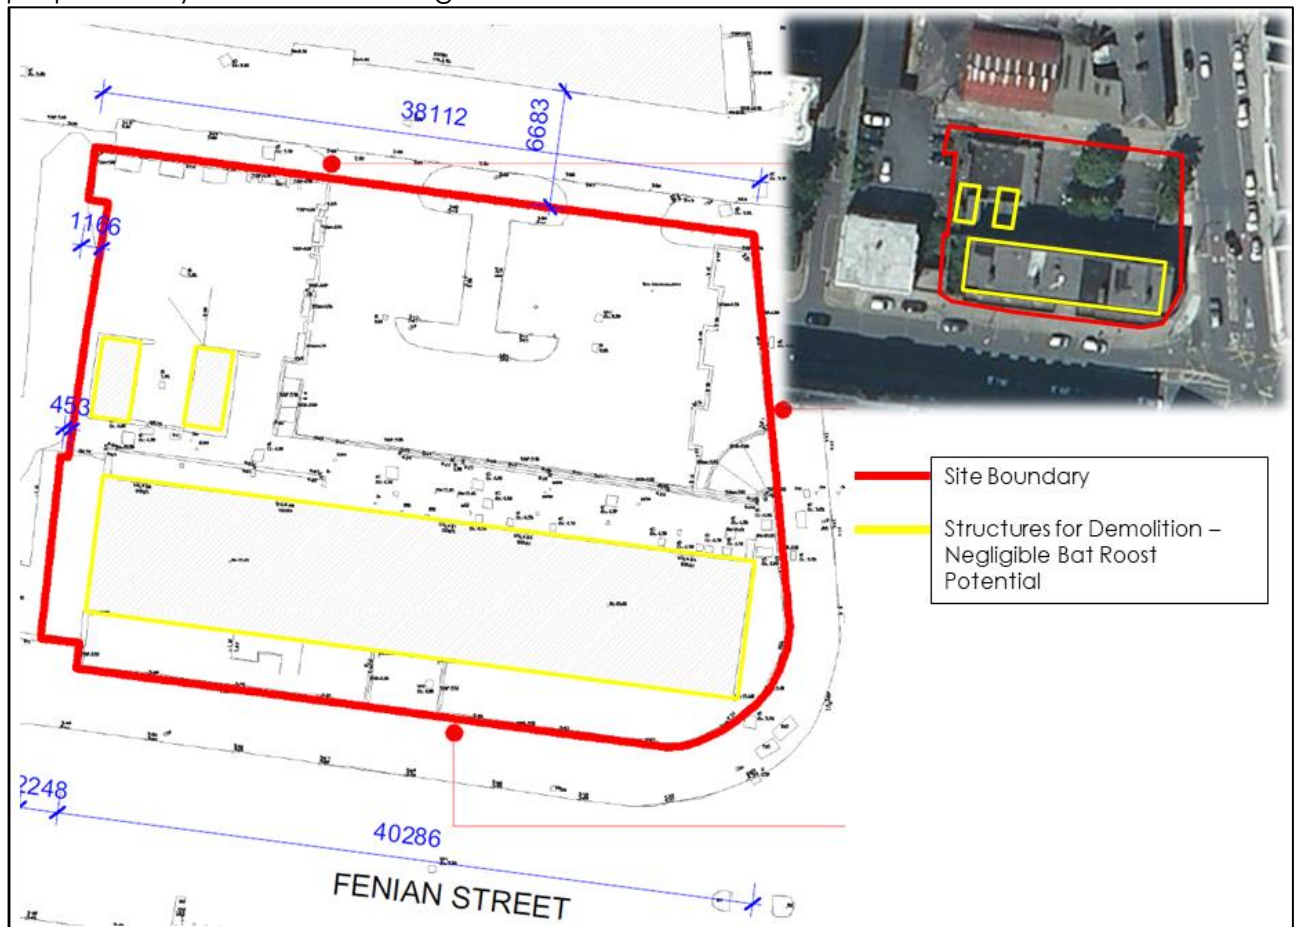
Existing Site Layout showing structures for demolition (outlined in yellow)
